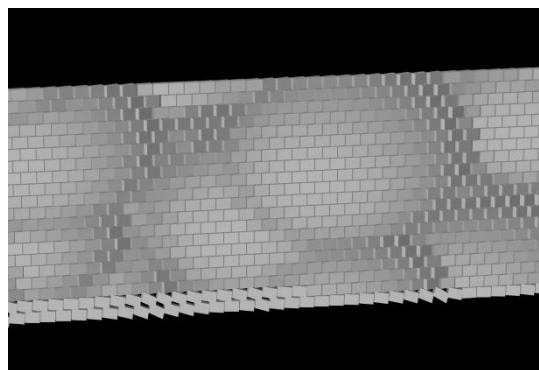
A sample of the 'grape wall' generated at the DAD studio.
